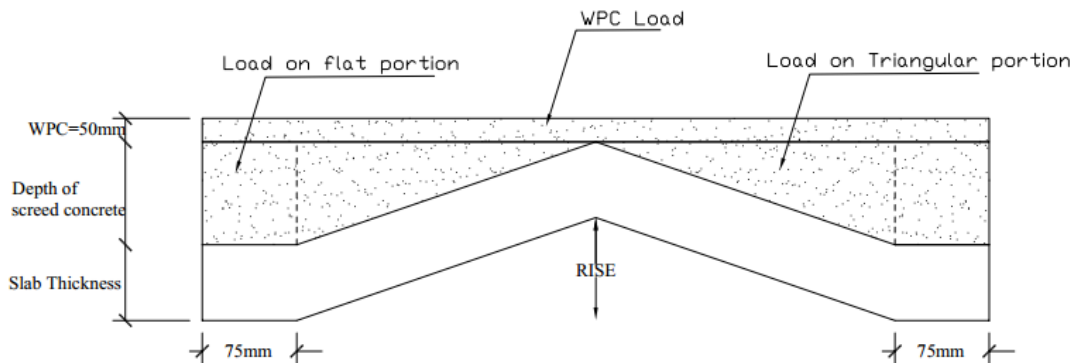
Panel Thickness and Floor Finishes Considered For Slab
